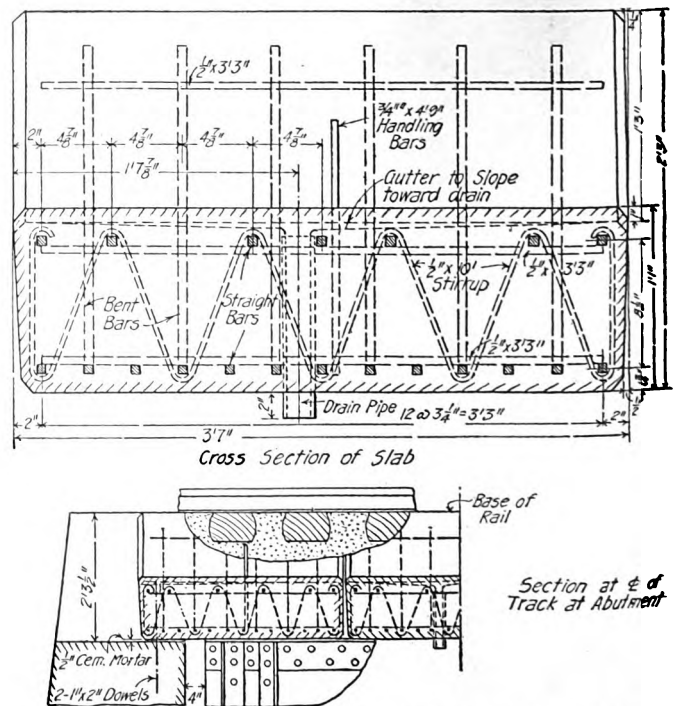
Sections of Slabs in Concrete Deck for Plate Girders, C., M. & St. P. Ry.
